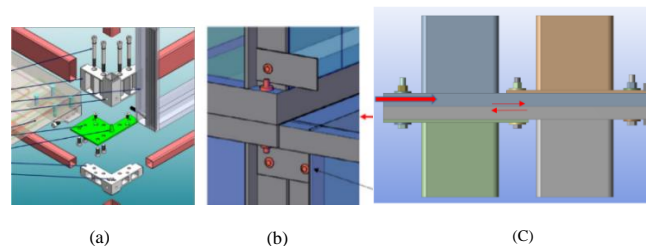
Different types of Modular building connections (Gunawardena 2016, Chen, Liu et al. 2017)
